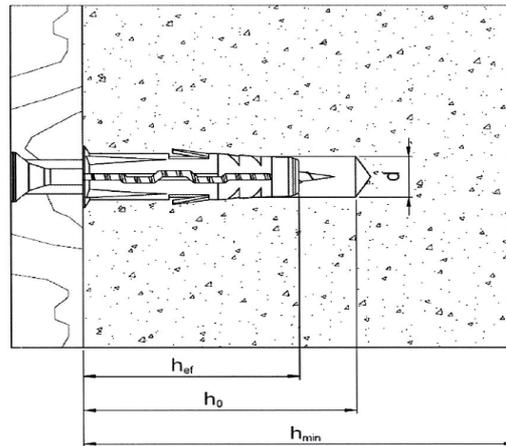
Parameters for installation and arrangement of UNO and UNO TIMBER expansion anchors in other substrates
